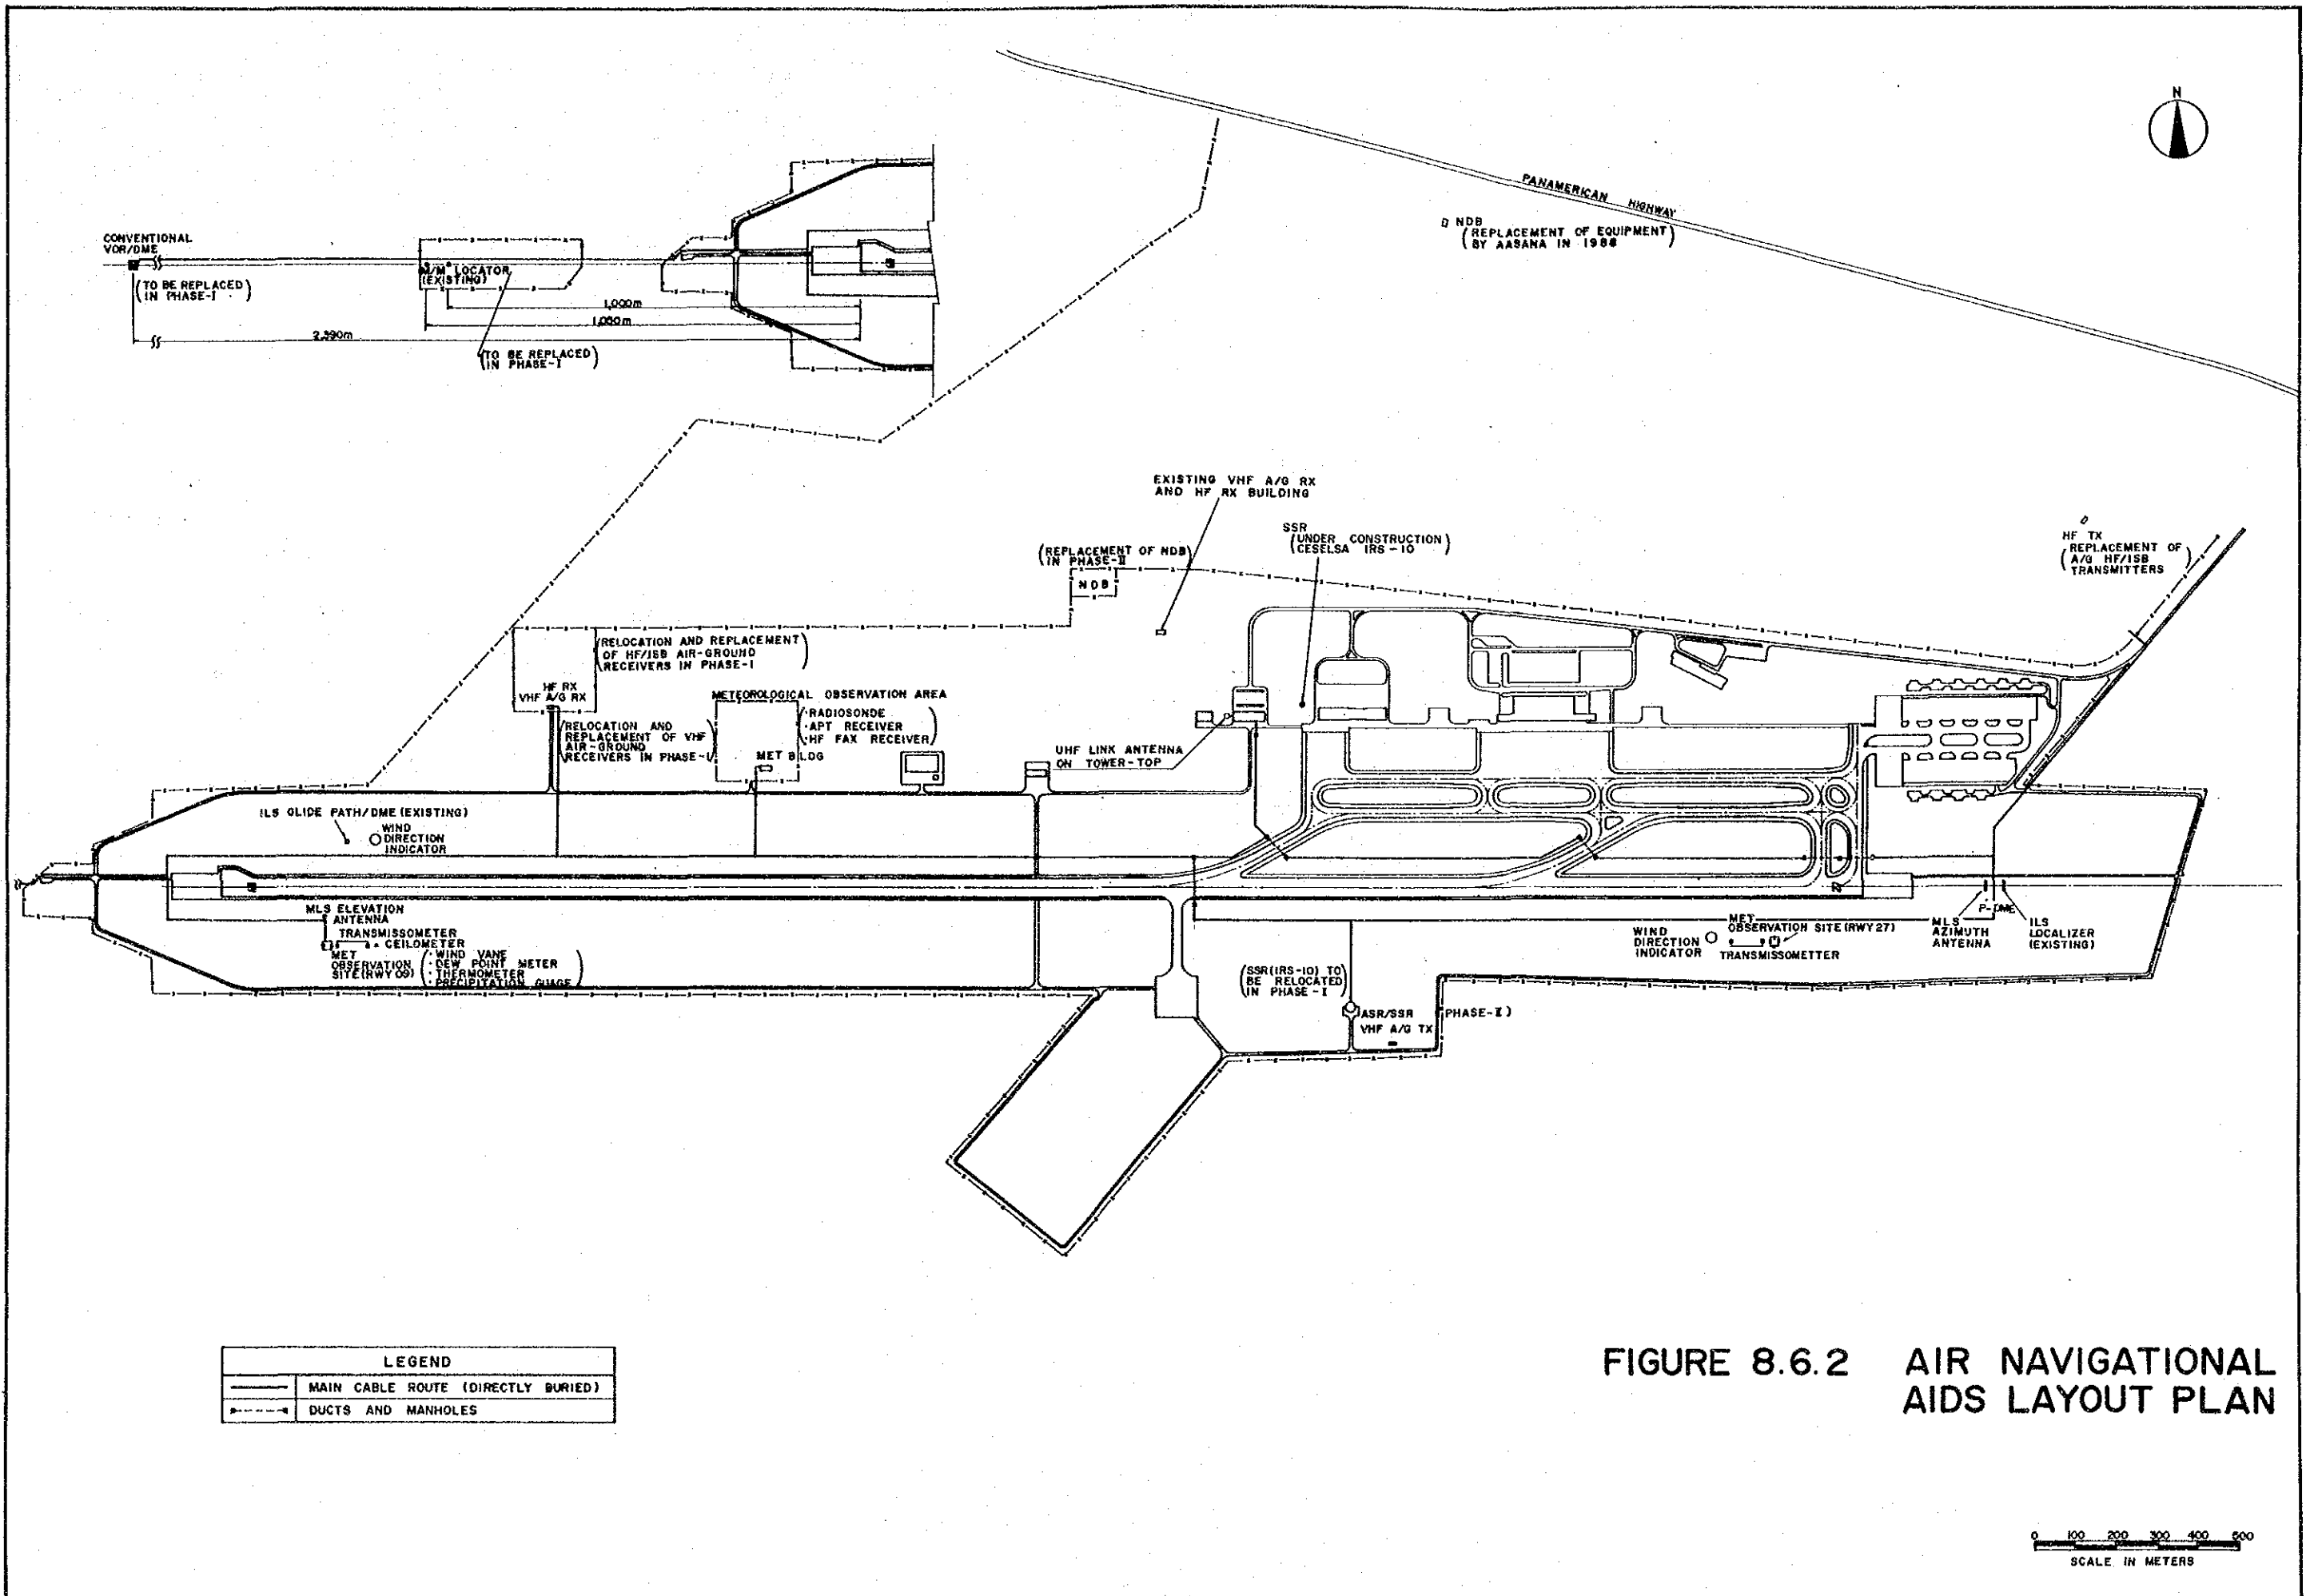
AIR NAVIGATIONAL AIDS LAYOUT PLAN
